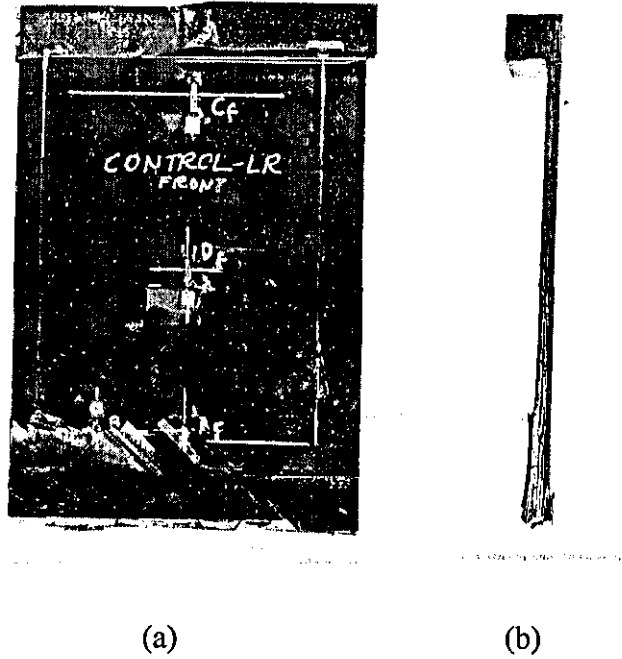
Photographs of a failed 4-mm thick intact panel (Control 0) (a) front view and (b) side view
